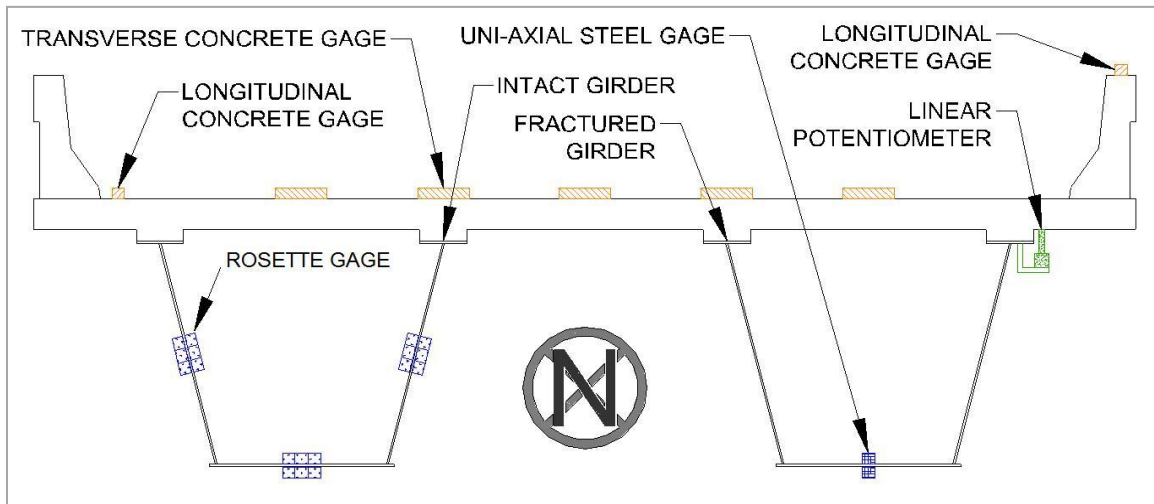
The instrumentation plan of the cross-section for Test 2 [Neuman, (2009)]
